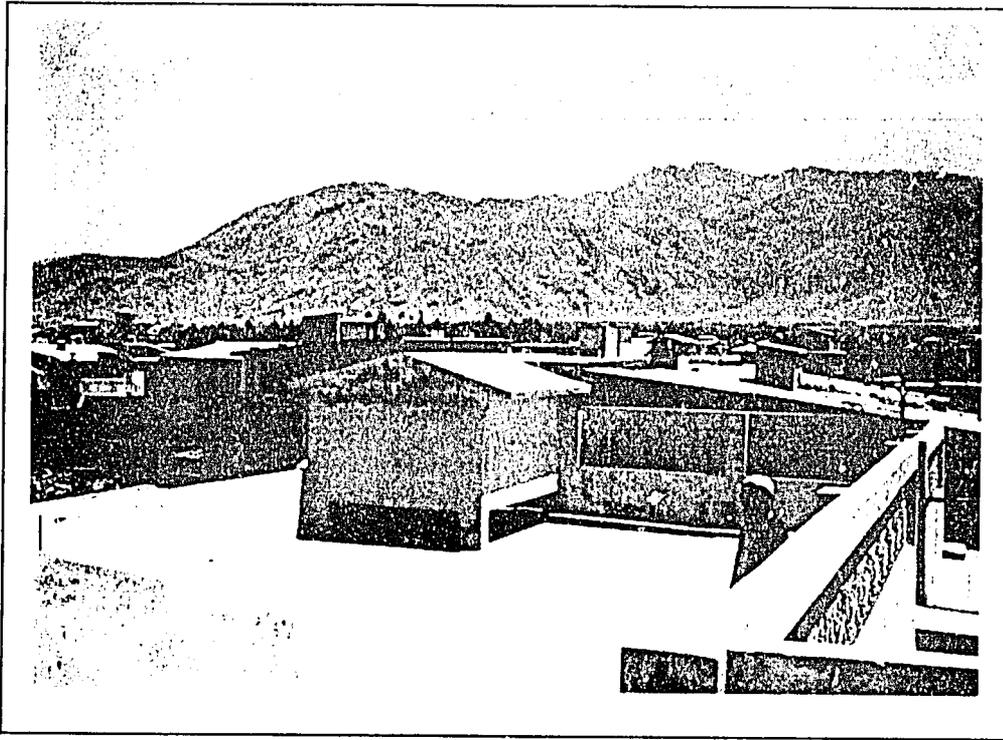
Quetta AID/REP Office Facility. View from roof facing East.
